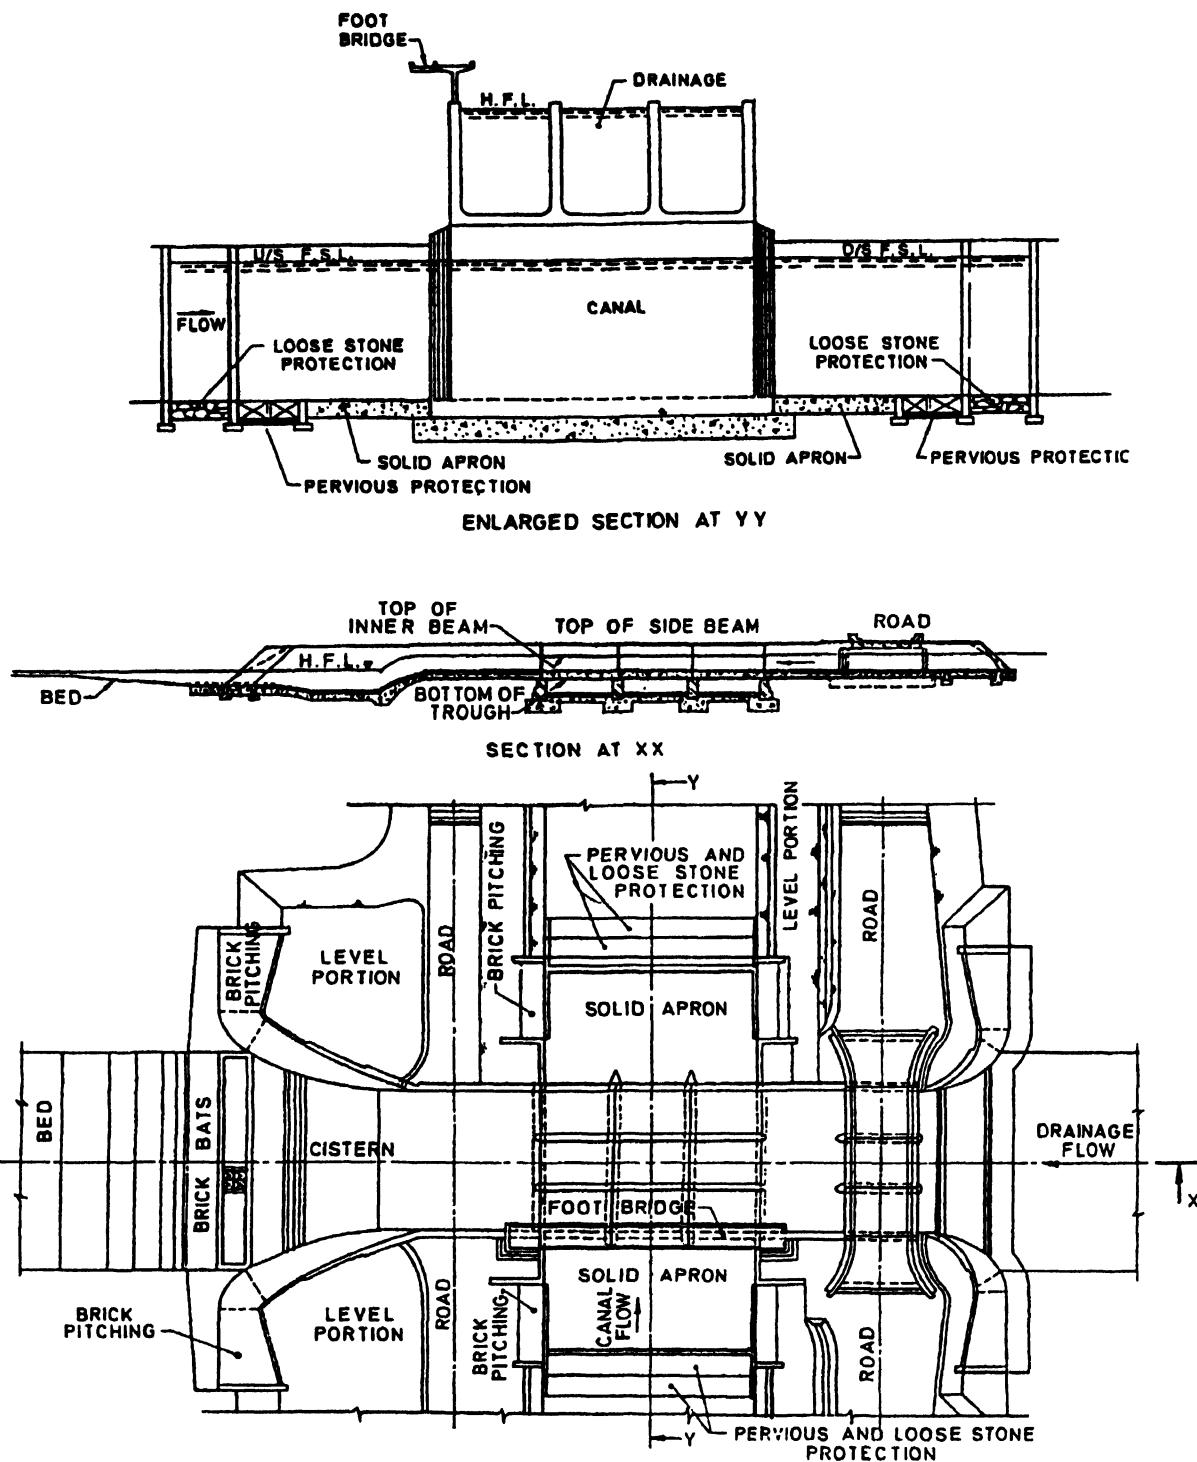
A TYPICAL LAYOUT OF A SUPERPASSAGE
